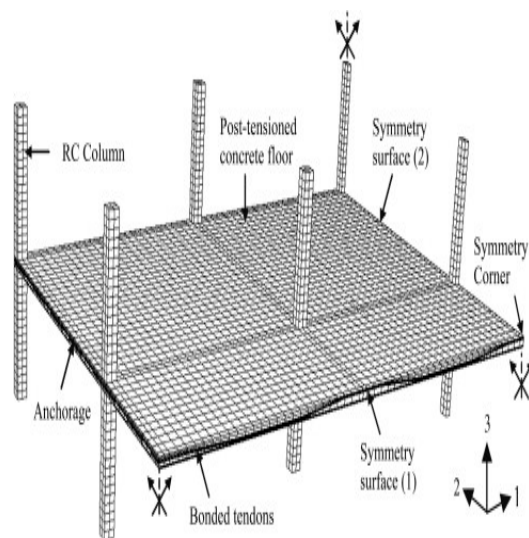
Typical post tensioned floor and RC column (Building Construction 30 April 2017)
